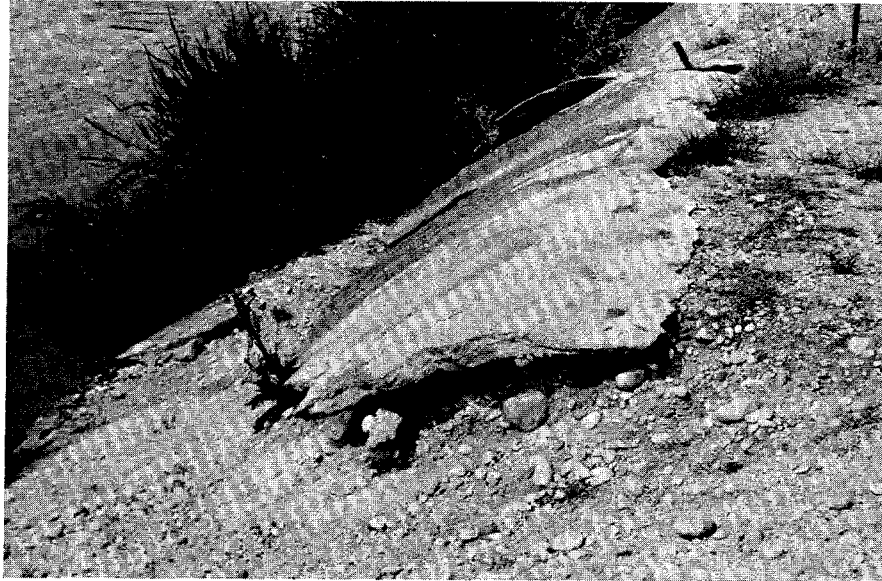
Damaged right-bank revetment, about 40 ft (1 m) downstream from bridge, in 1976.
